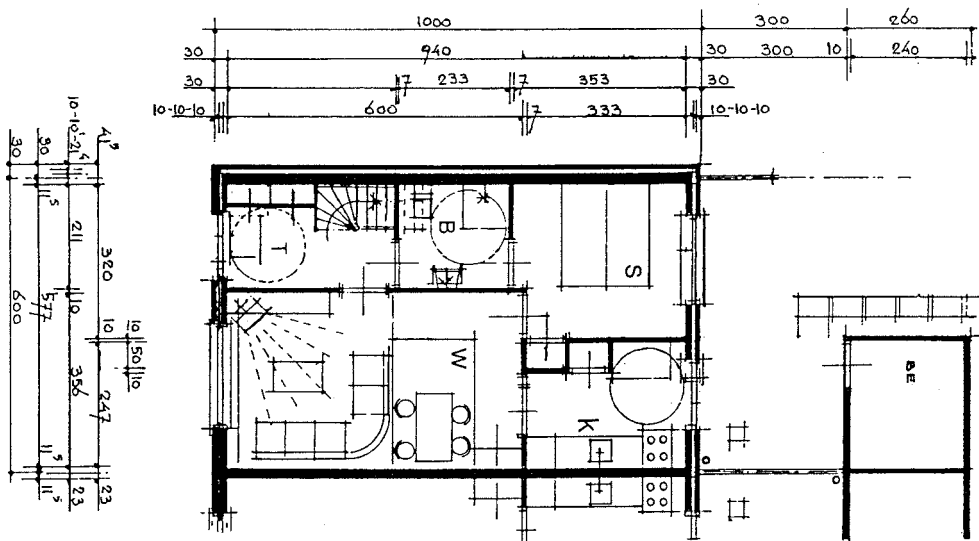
Floor plans of one-family homes in Oosterhout - adaptable design, first series of 10 homes. Legend: T = entrance hallway, W = living room, S = bedroom, K = kitchen, B = bathroom/toilet, Be = storage.
